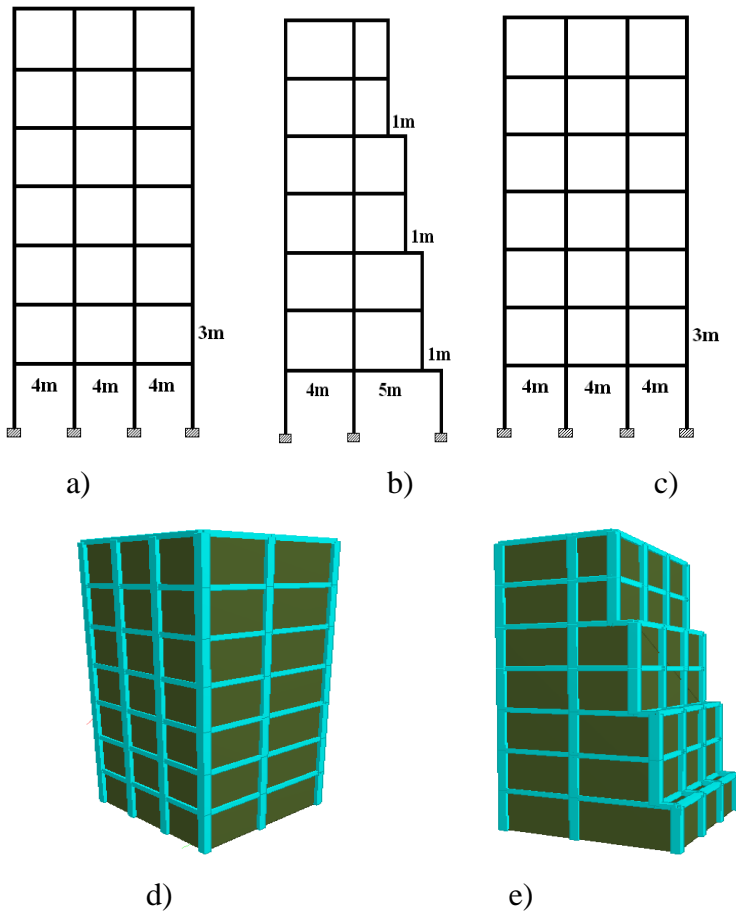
Views of 3D regular and irregular building model considered. a) Front and side elevation of regular building model b) Front elevation of irregular building model c) Side elevation of irregular building model d) Typical 3D View of regular building e) Typical 3D View of irregular building
